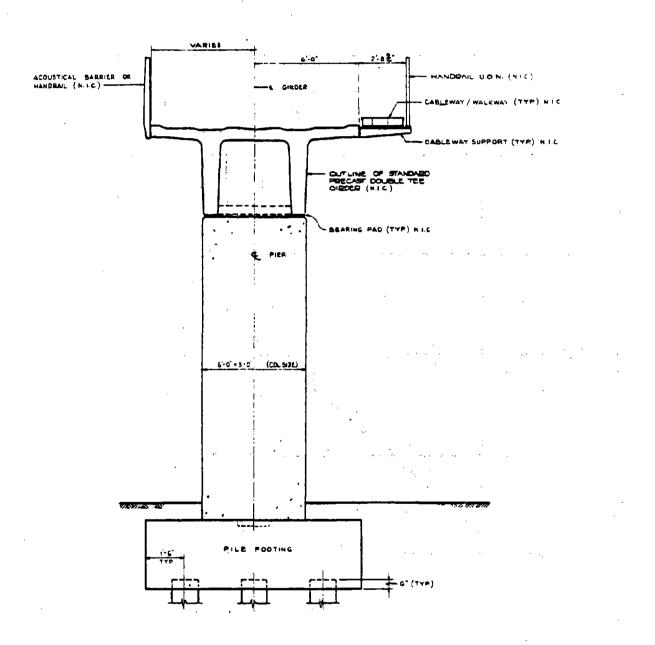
TYPICAL SECTION OF PROPOSED DADE METRORAIL ELEVATED STRUCTURE
